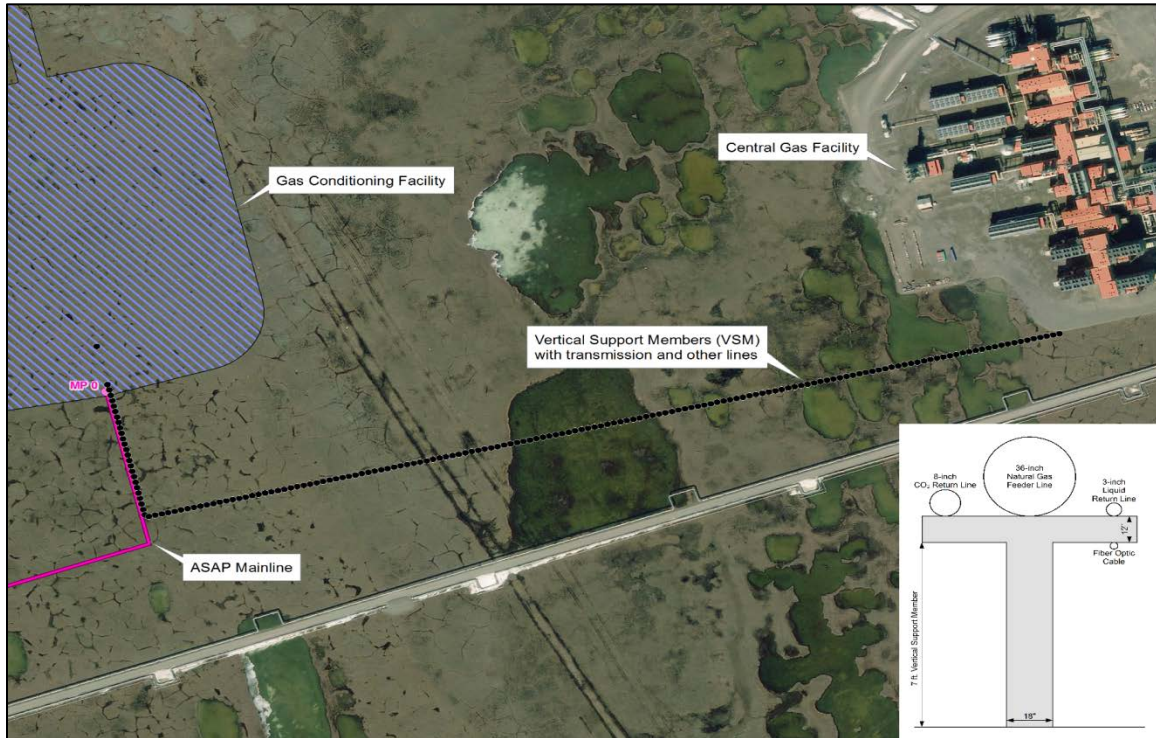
Placement and Orientation of Connecting Lines between the Gas Conditioning Facility and the Existing Central Gas Facility
